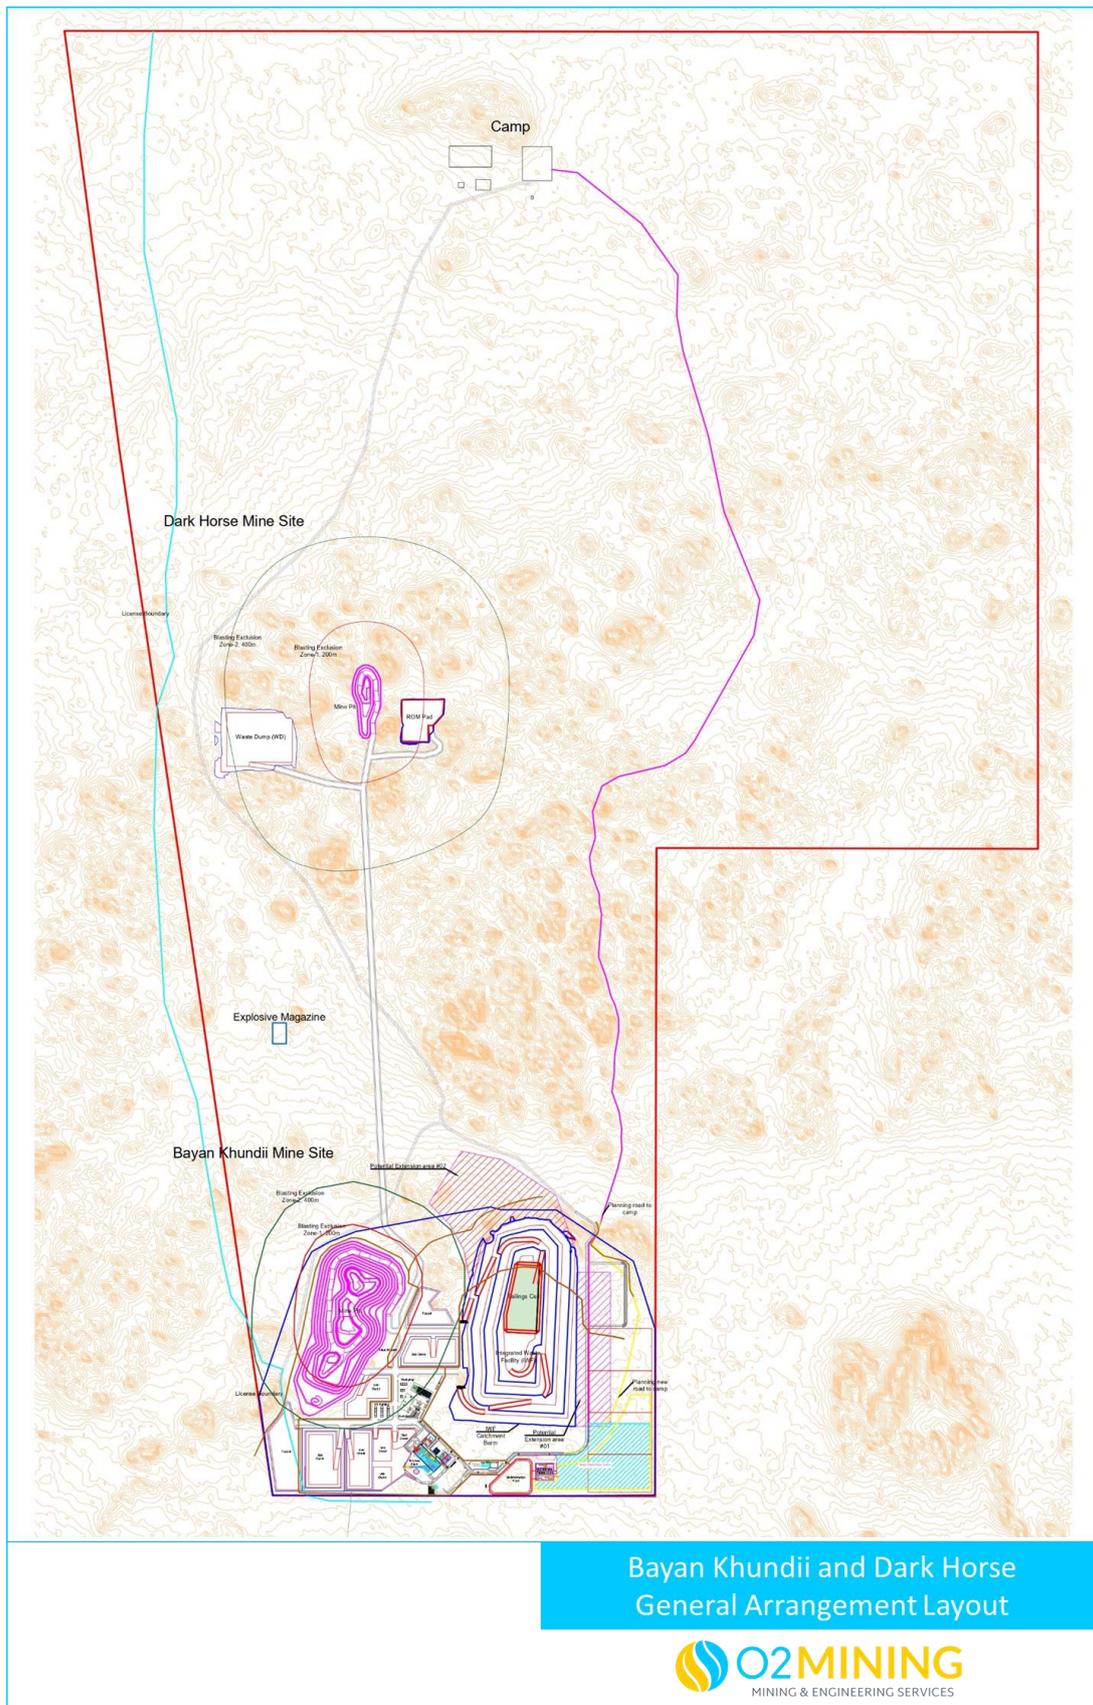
Project General Arrangement Layout (Source O2 2023)
